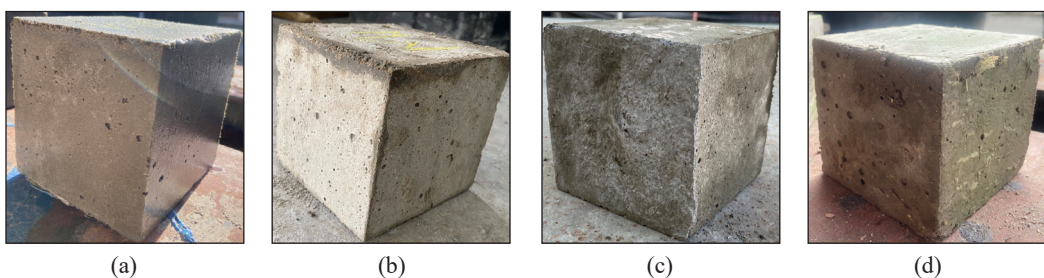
(a) Concrete mix C1; (b) Concrete mix C2 (5% aluminum dross); (c) Concrete mix C3 (10% aluminum dross); and (d) Concrete mix C4 (15% aluminum dross)
